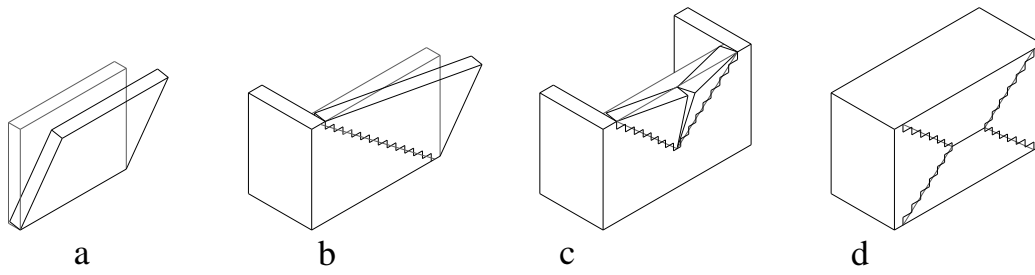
Typical out of plane collapse mechanisms of a masonry wall with increasing restraints.
